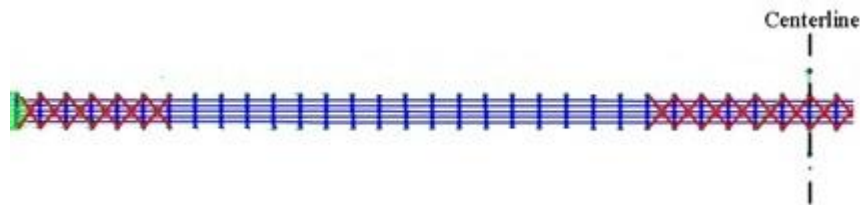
Lateral Bracing Pattern for 60 m Span Footbridge
